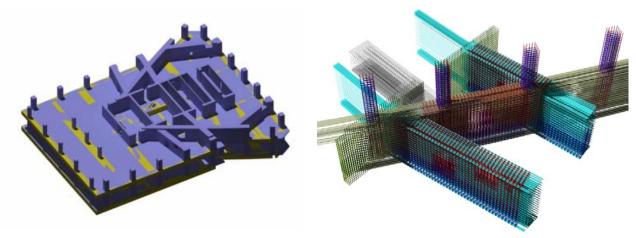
3D models for Level 30 transfer floor: Structure (left) and reinforcement (right)
